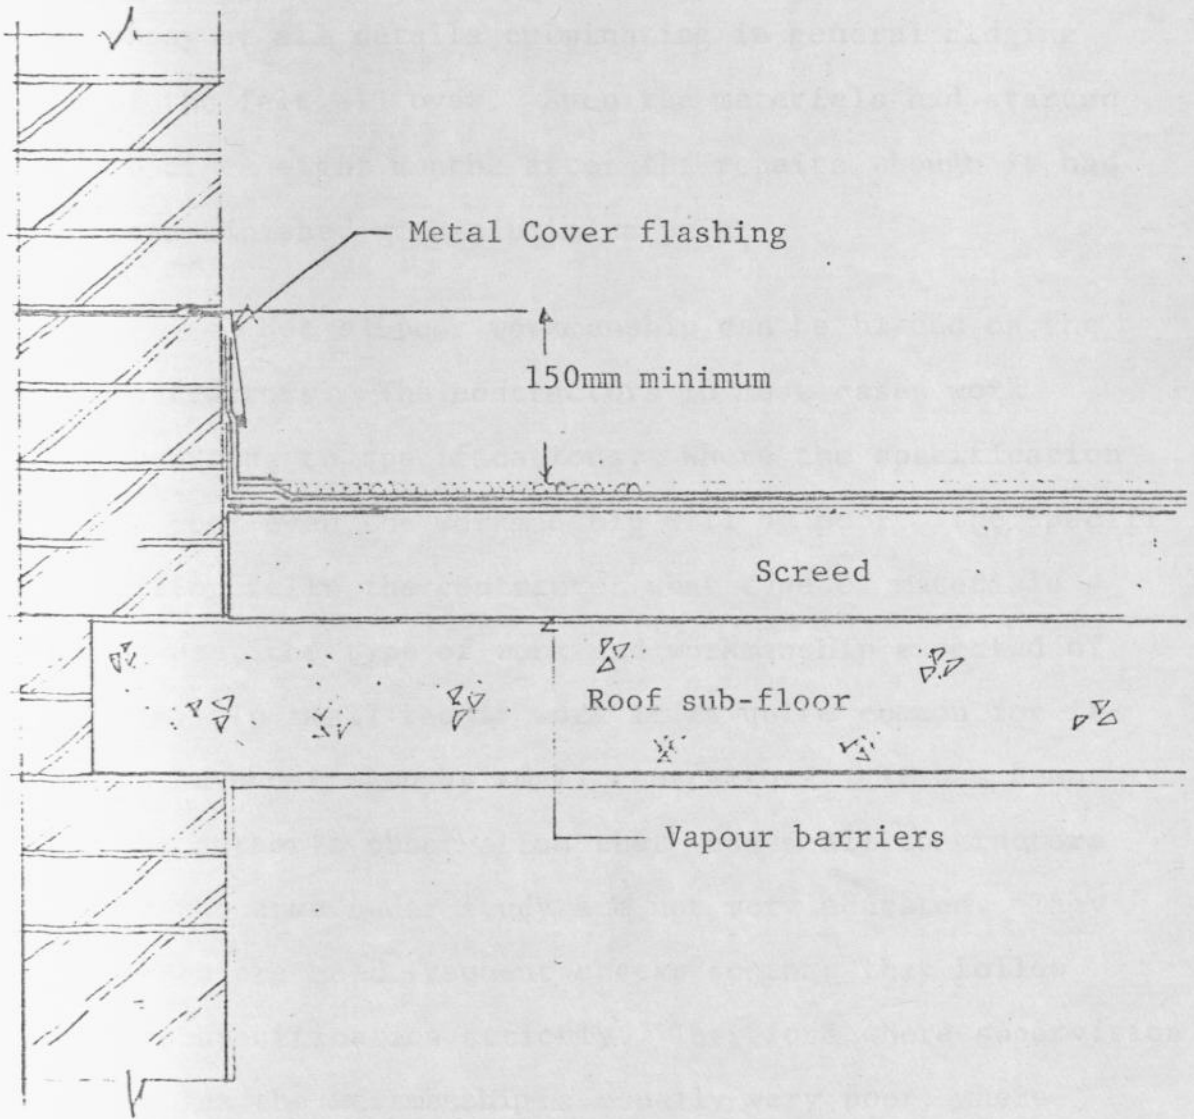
BUILT-UP FELT ROOFING: DETAIL OF ABUTMENT
